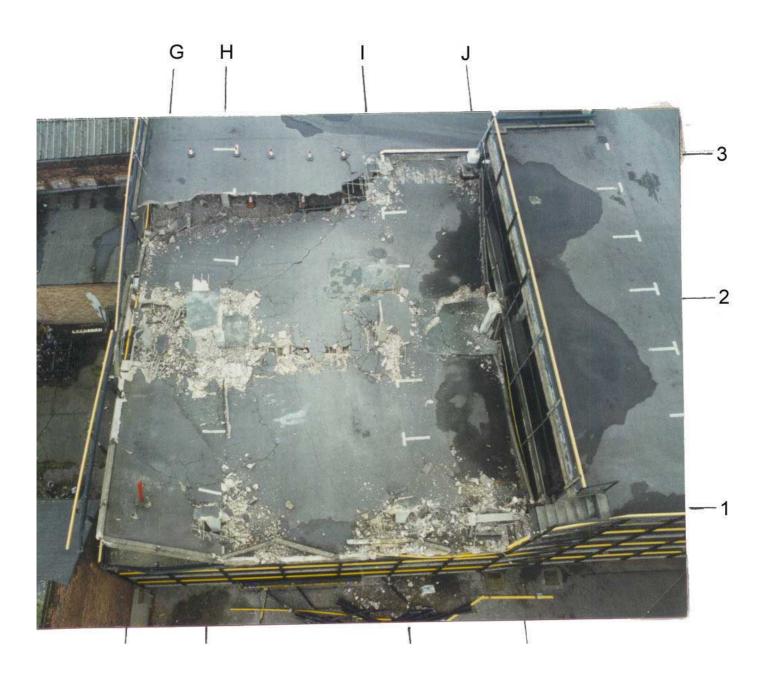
1 Photo from above the collapsed slab [H17]
